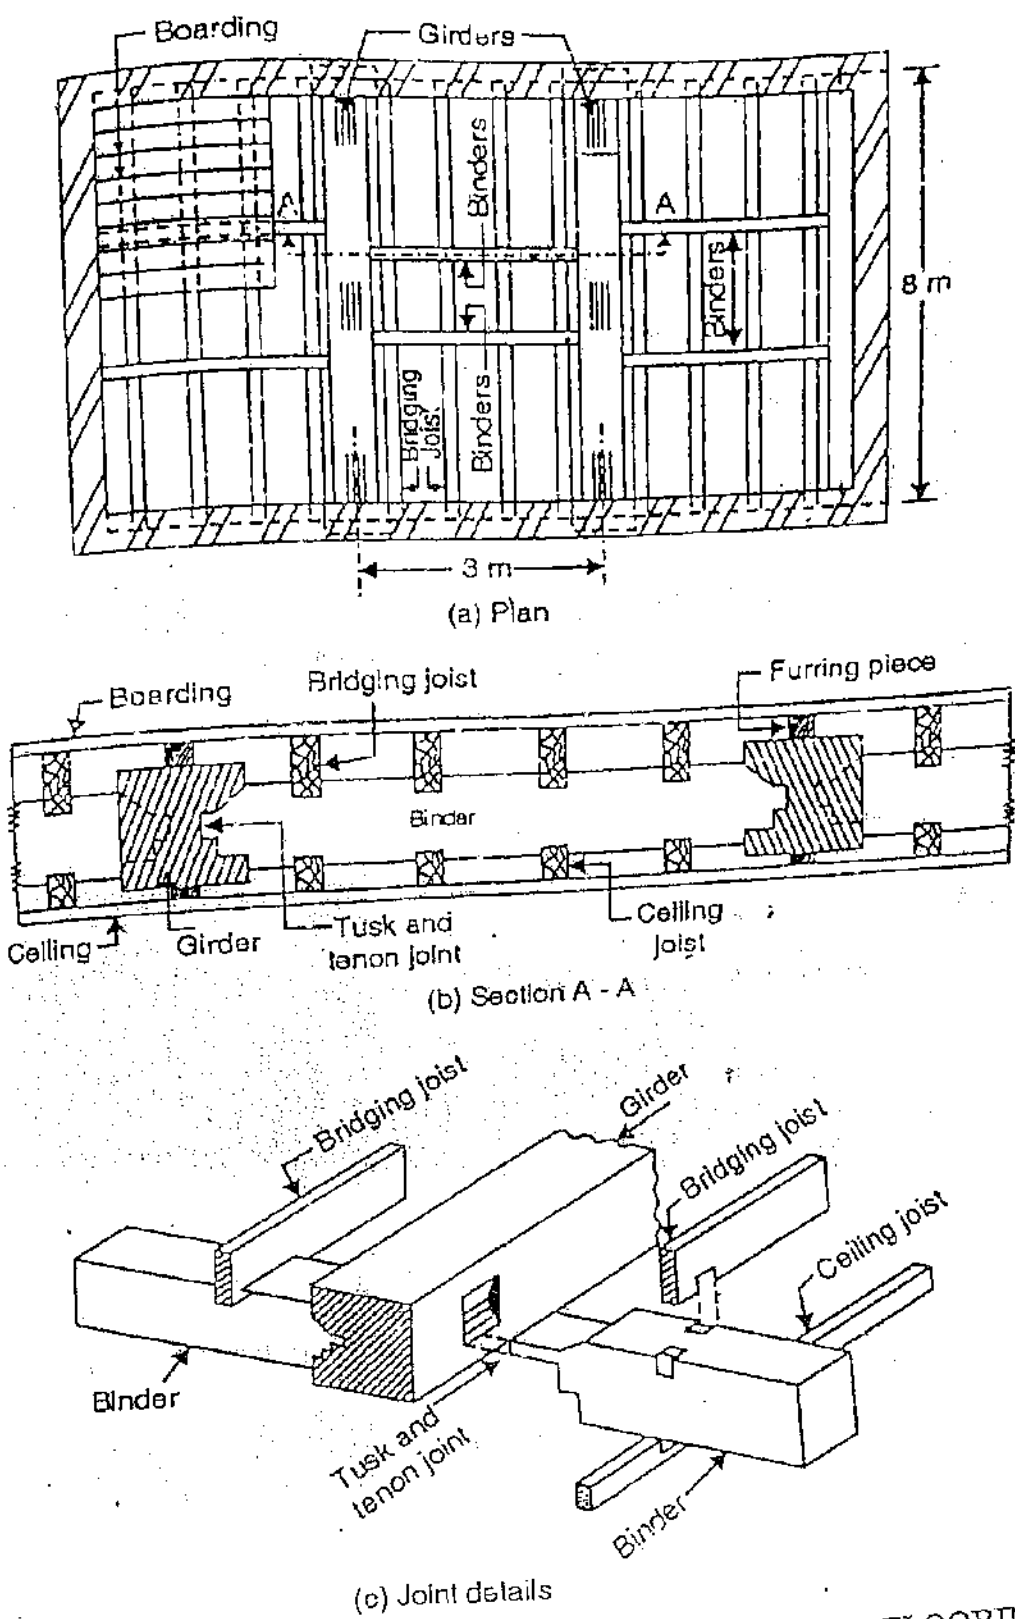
FRAMED OR TRIPLE JOISTS TIMBER FLOORING
